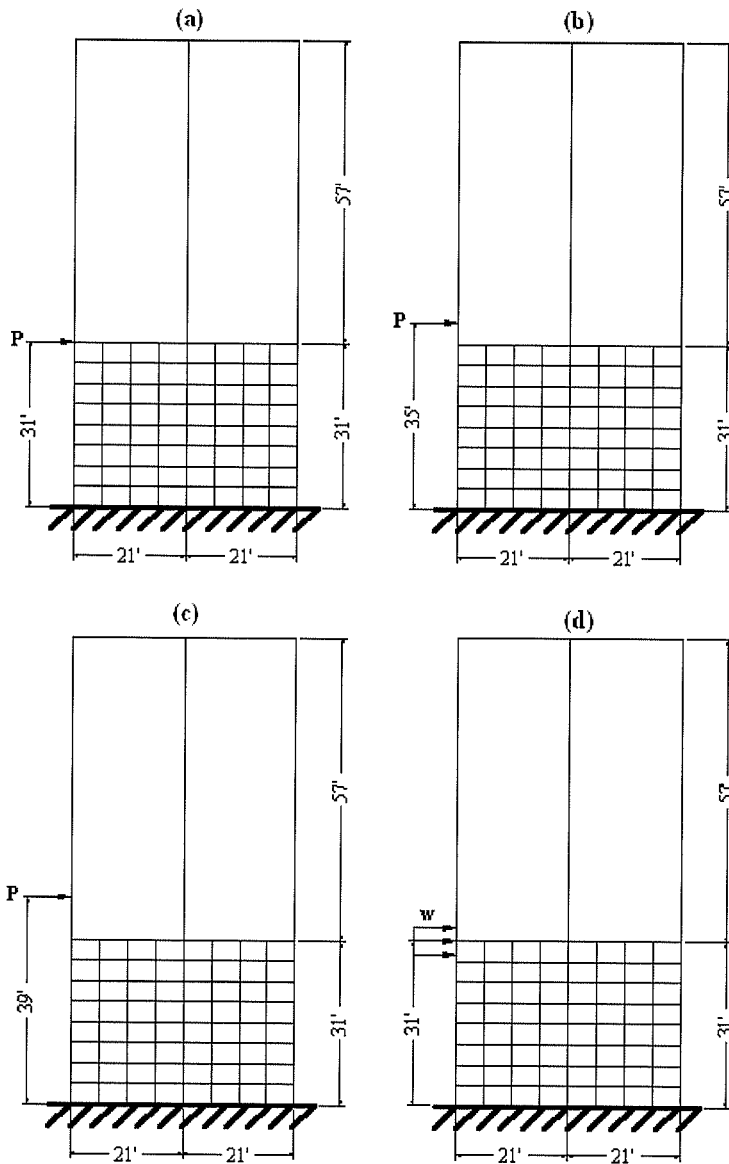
SH-87 Impact Loads: (a) Load Location 1: Point Load at Top of Wall, (b) Load Location 2: Point Load 48 inches Above Wall, (c) Load Location 3: Point Load 96 inches Above Wall, (d) Location 4: 60-inch Wide Distributed Load at Wall
